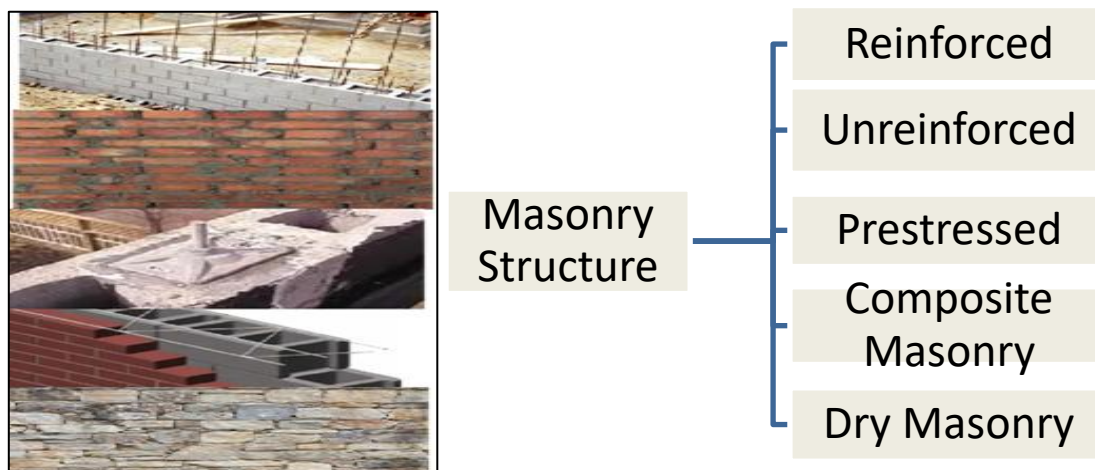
1 Types of Masonry Structures Source: CMP stone
